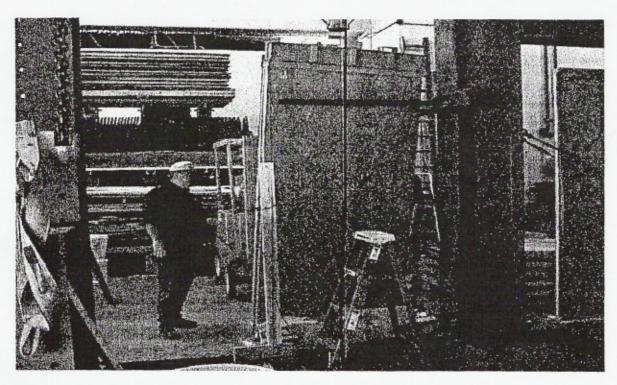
Failure of 8' OSB-OSB Panel Under Compressive Loading
